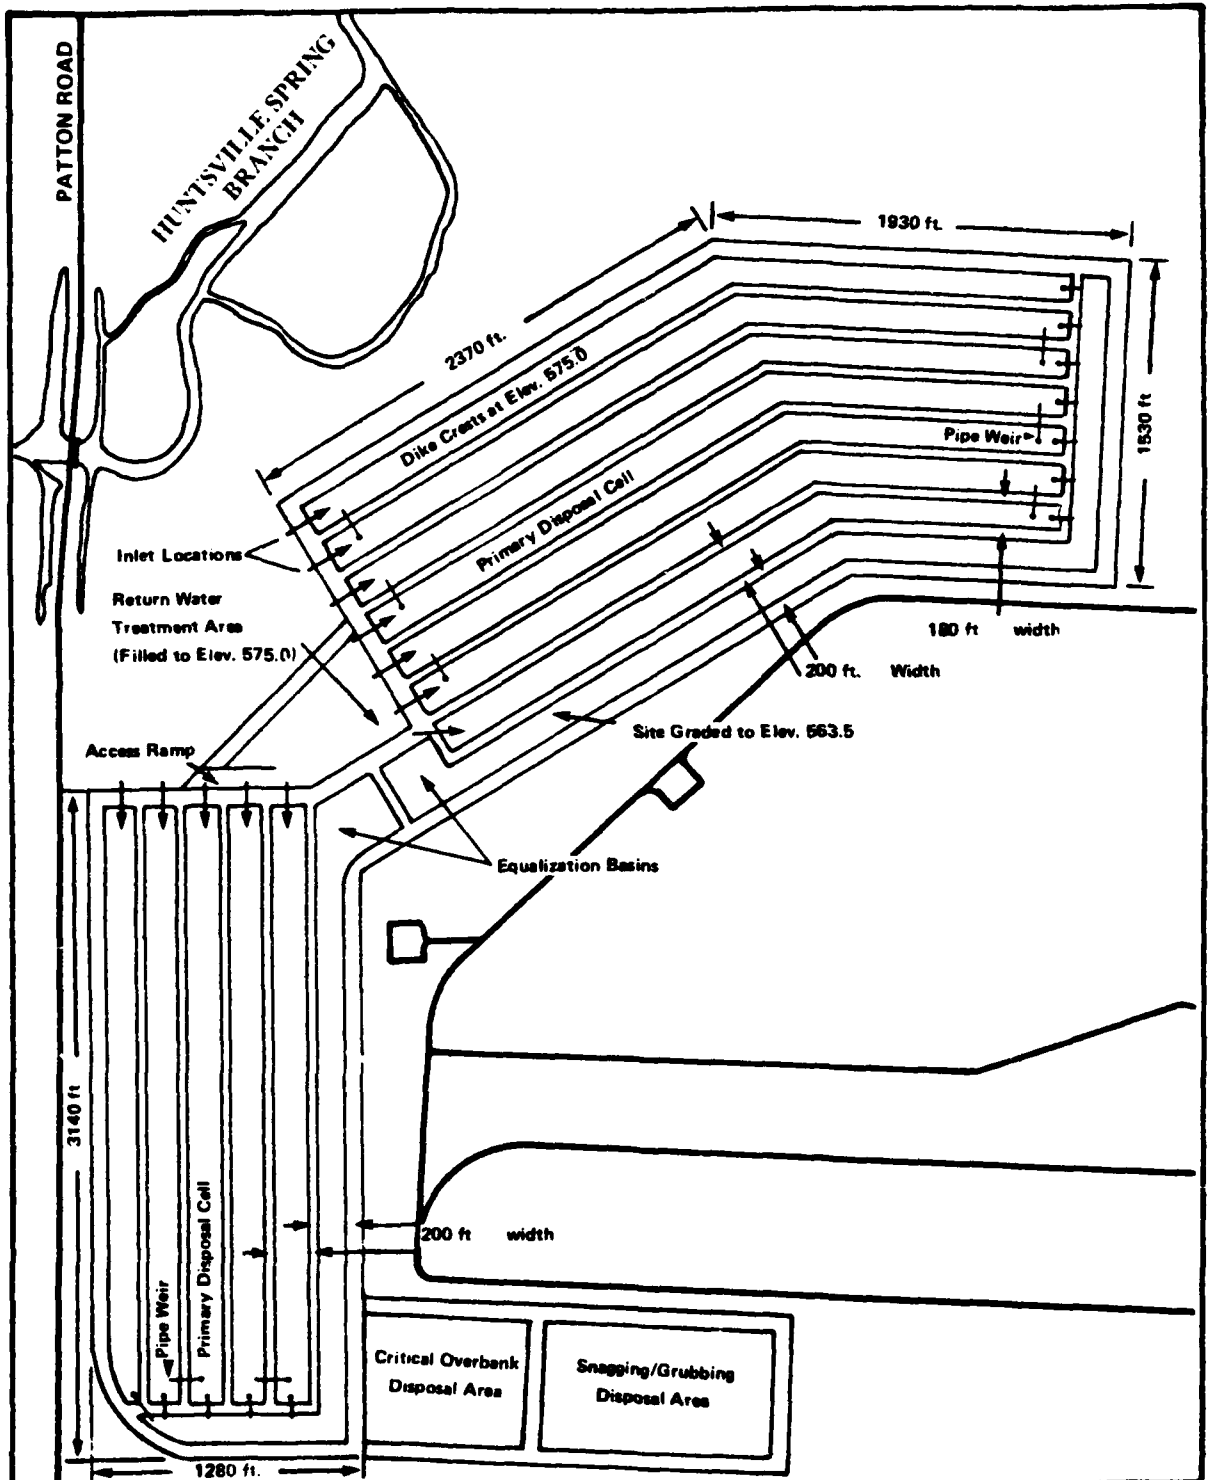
Temporary Dredged Material Disposal Area Site Plan
